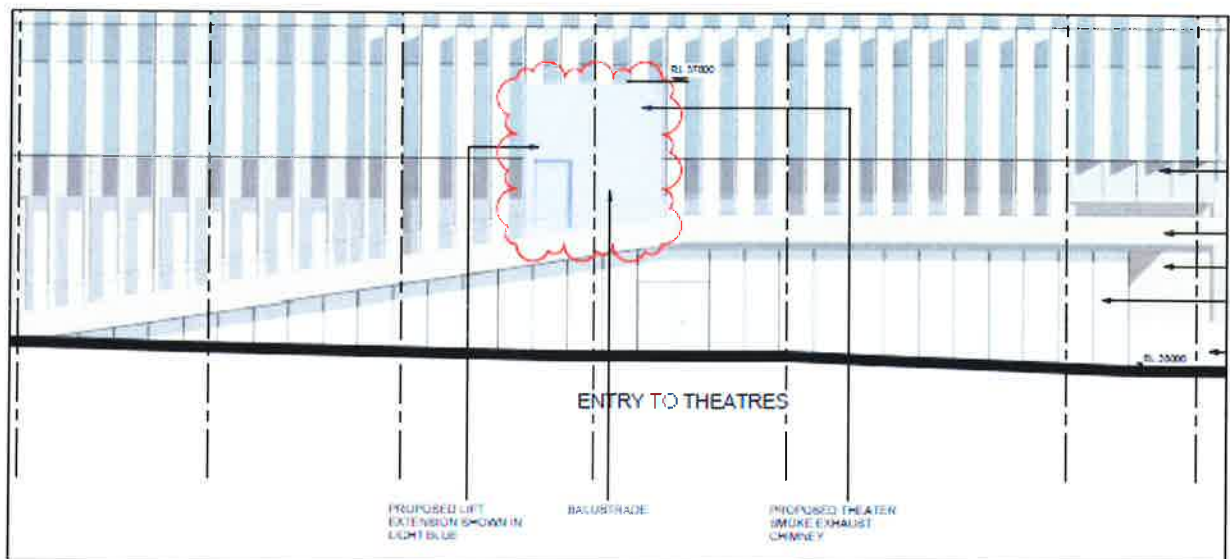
Proposed mezzanine level (Source - SSD 7518 MOD 1 Modification Request)
